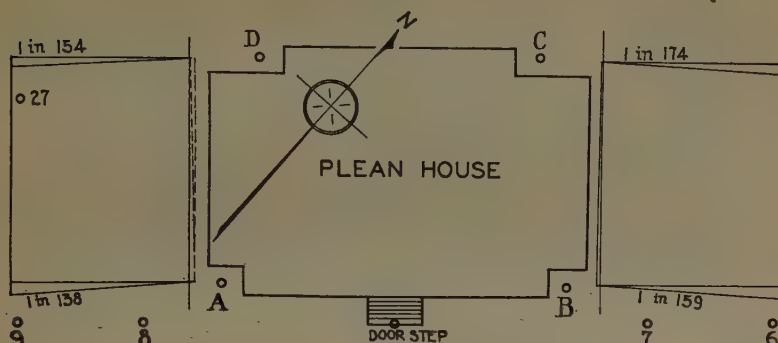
PLAN AND ELEVATIONS SHOWING POSITION OF PLUMBS IN RELATION TO POINTS 6 TO 9 AND 27 TO 9; ALSO SWING OF HOUSE AS INDICATED BY PLUMBS.
